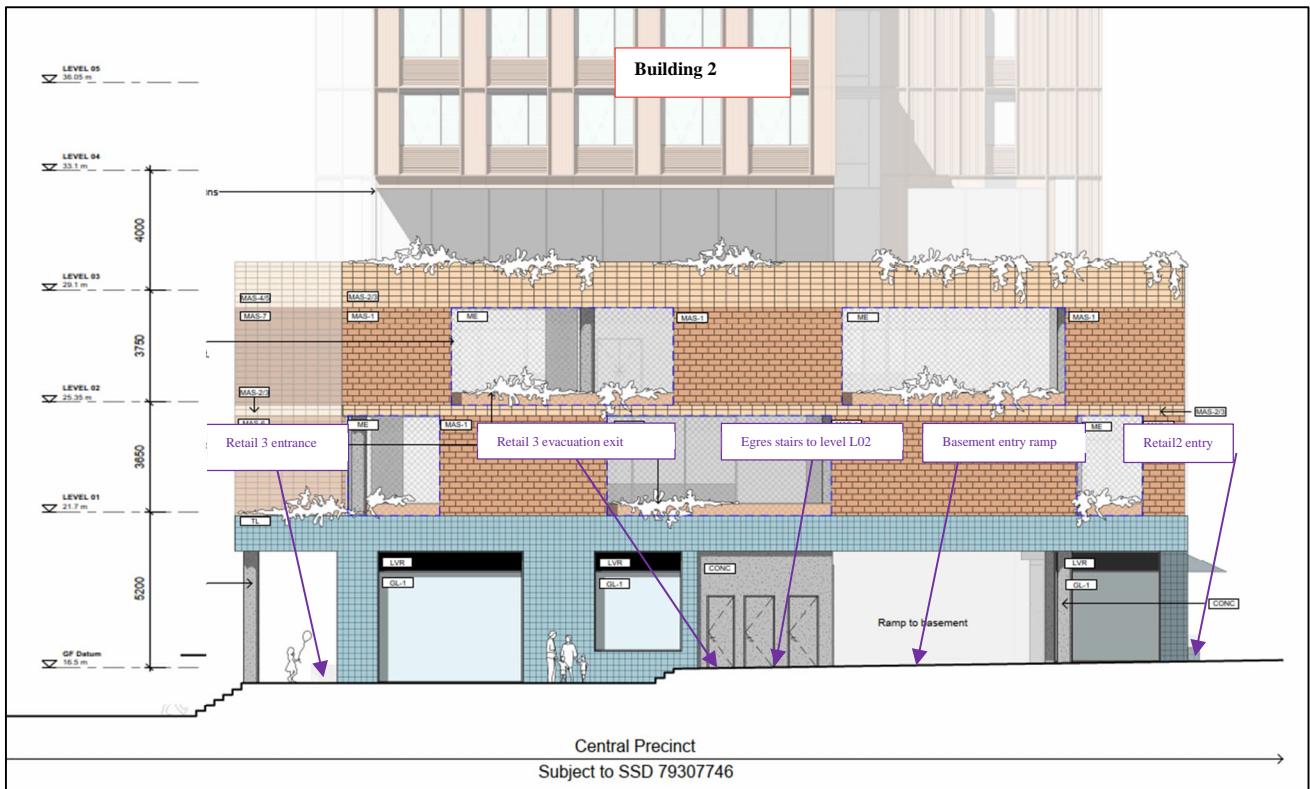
Central Precinct external elevation - south view (from Church Square)
